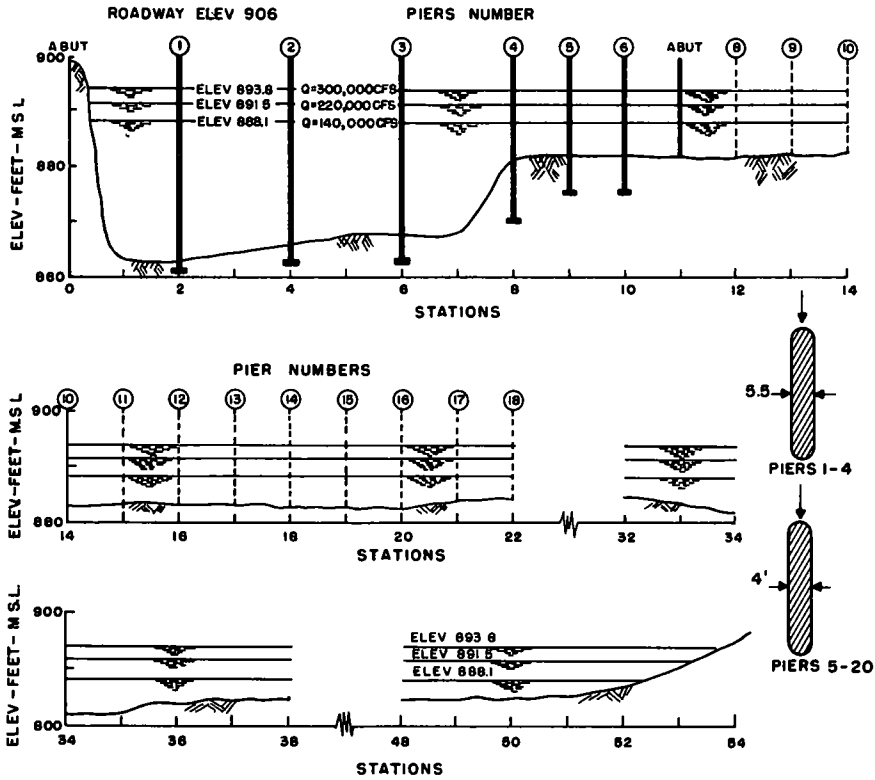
Section of river at bridge facing upstream, example 1 (long bridge) (courtesy of J.N. Bradley).
